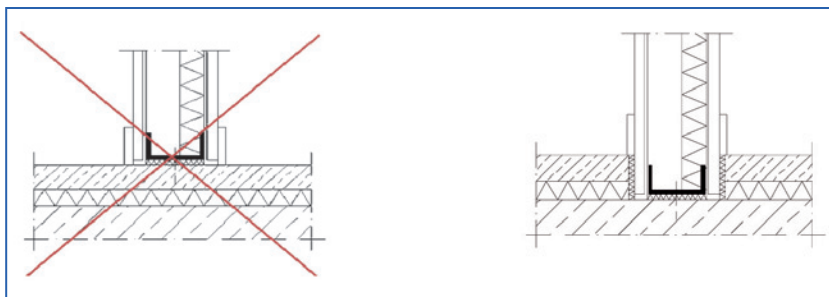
Lightweight wall built on top of the floating floor (left) - faulty solution and the correct solution with the wall built directly on the supporting floor structure.
